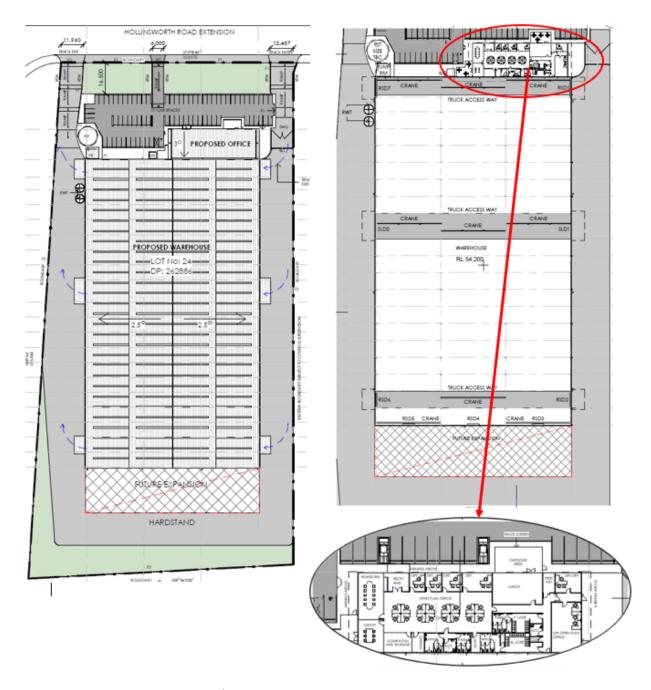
| Proposed Building 1 Site Plan and Floor Plan
